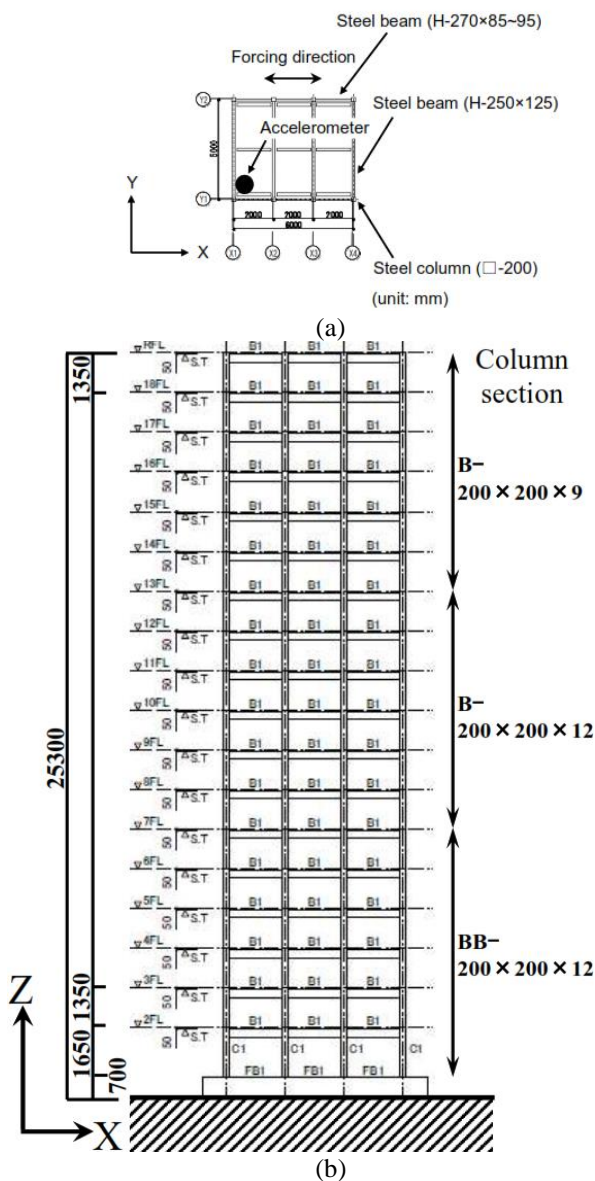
Outline of test specimen (a) floor plan and (b) structural framing elevation.
